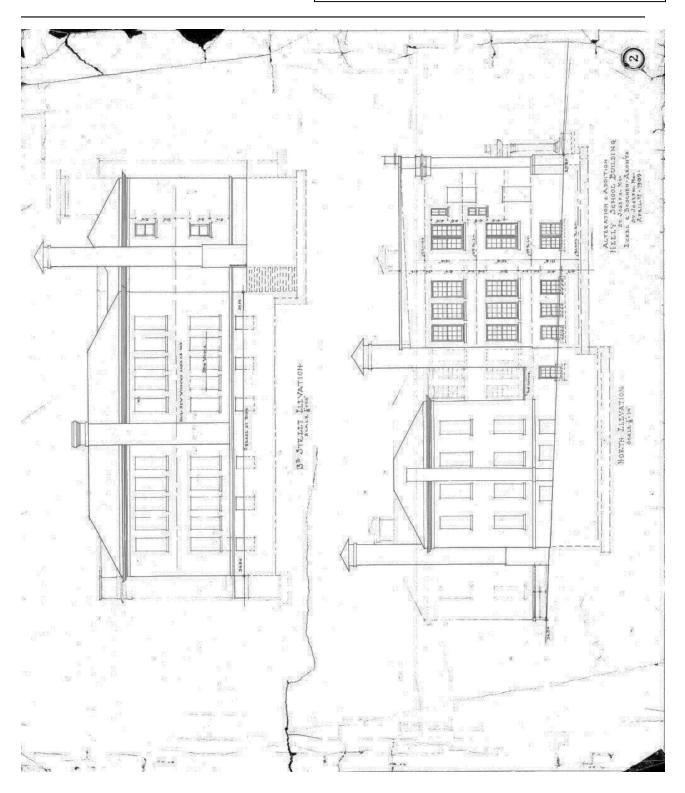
Eckel and Boschen Architects, Elevations, April 1909 (Architects 1909)
